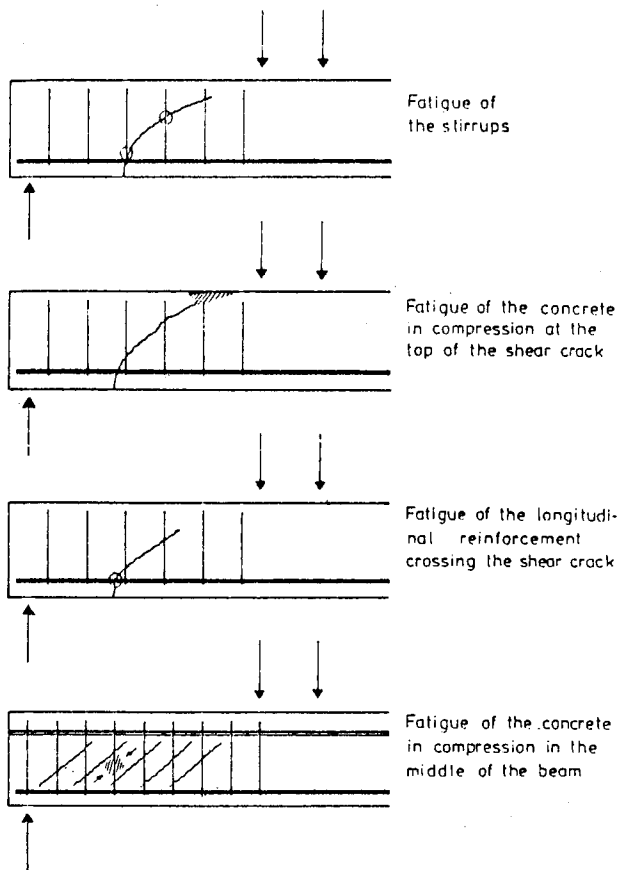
Possible shear fatigue failure in beams with stirrups.
